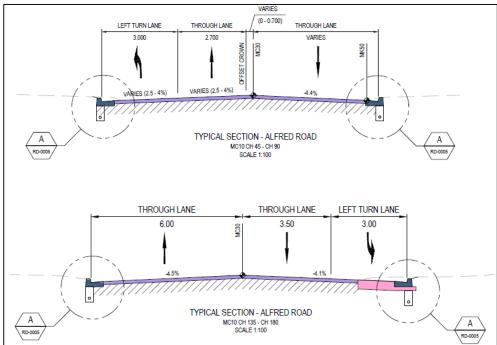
Proposed Typical Cross Sections - Alfred Road
